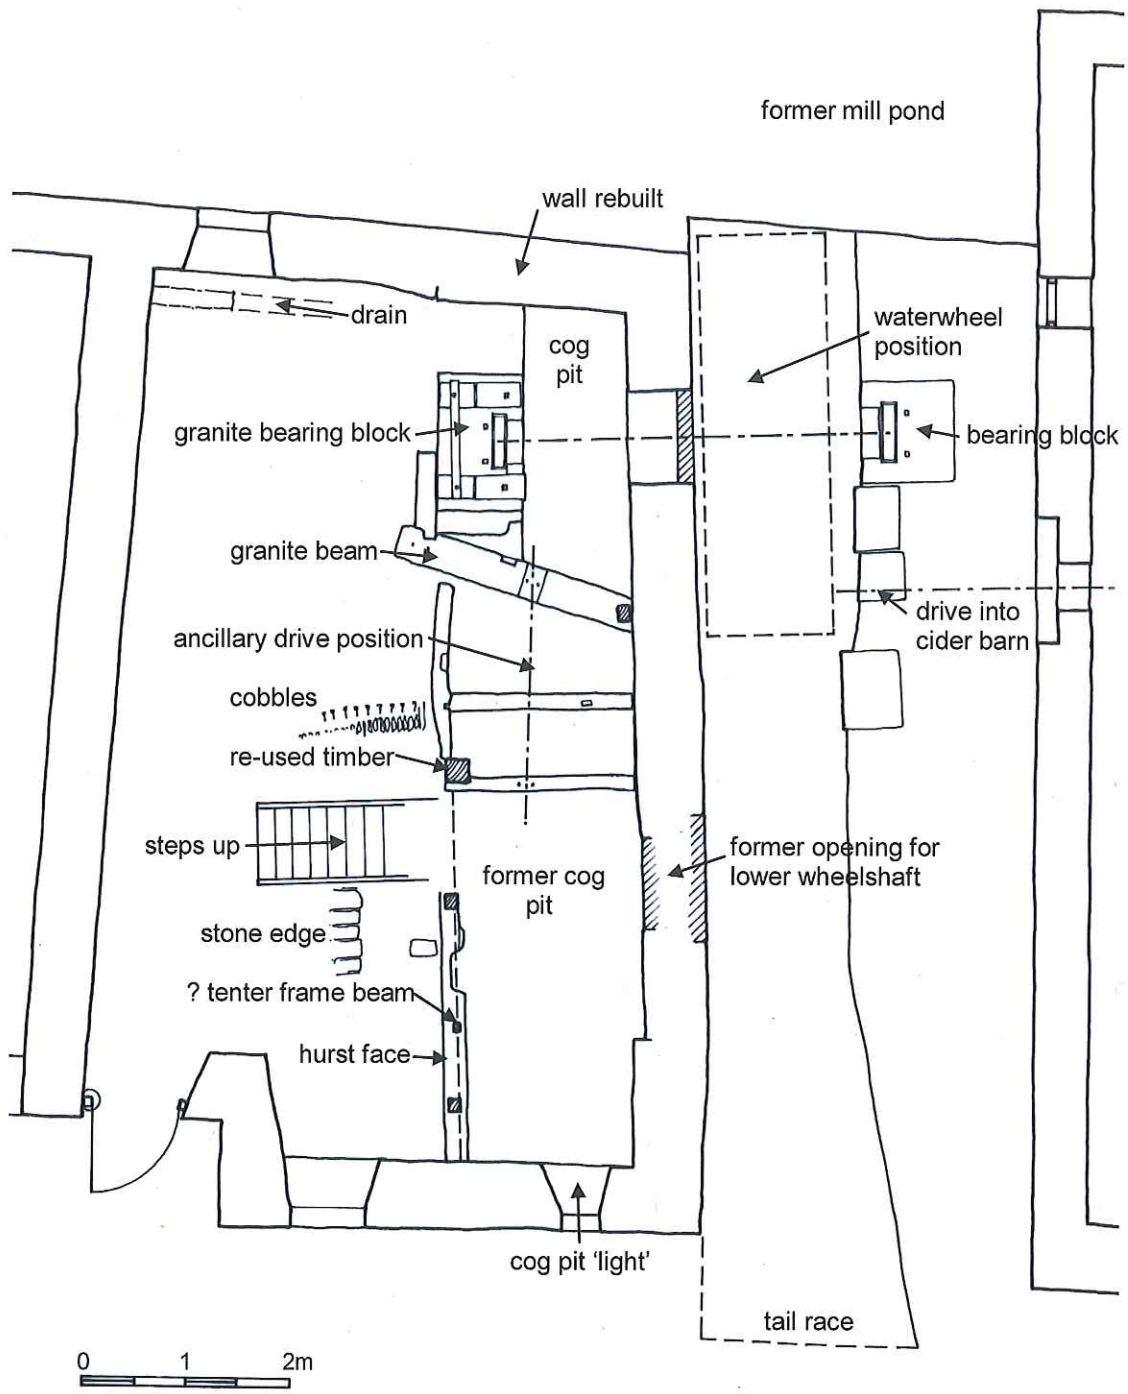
Lew Mill. Detailed ground floor plan of mill and wheelpit area
